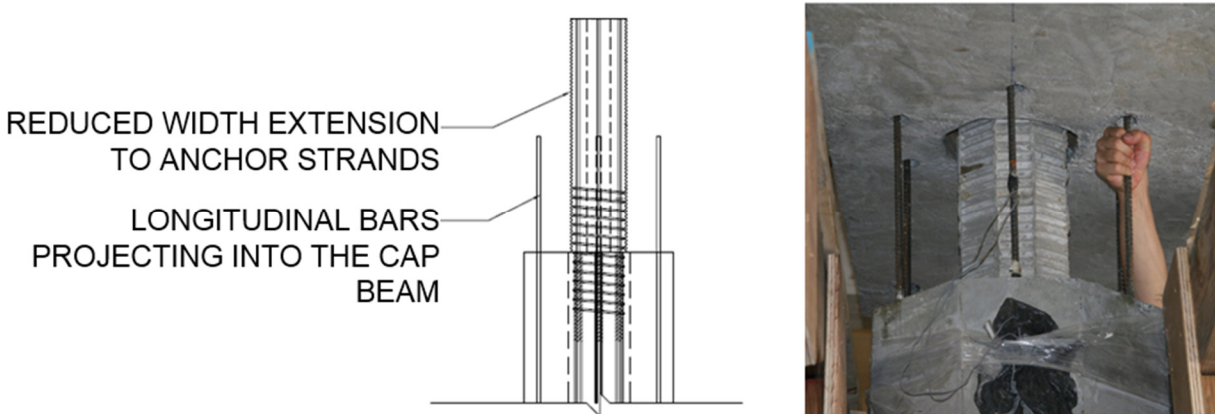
The column-to-cap-beam connection tested by Davis (adapted from Davis et al., 2012).
